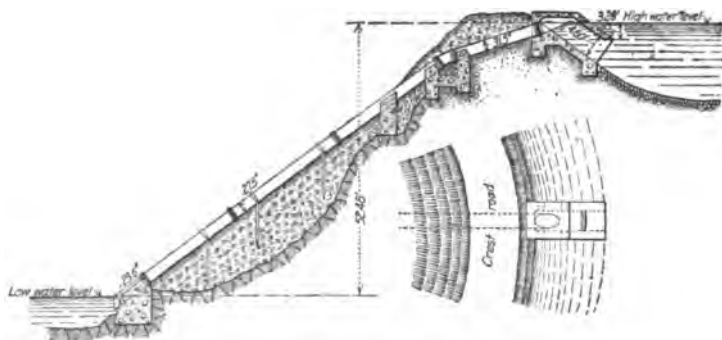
Elevation of high-head siphon at Gibewil, Switzerland.
